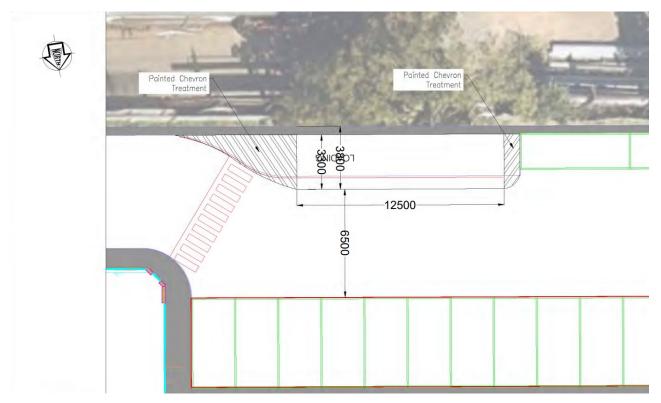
Albert Street Crossover - HRV Loading Zone 1
